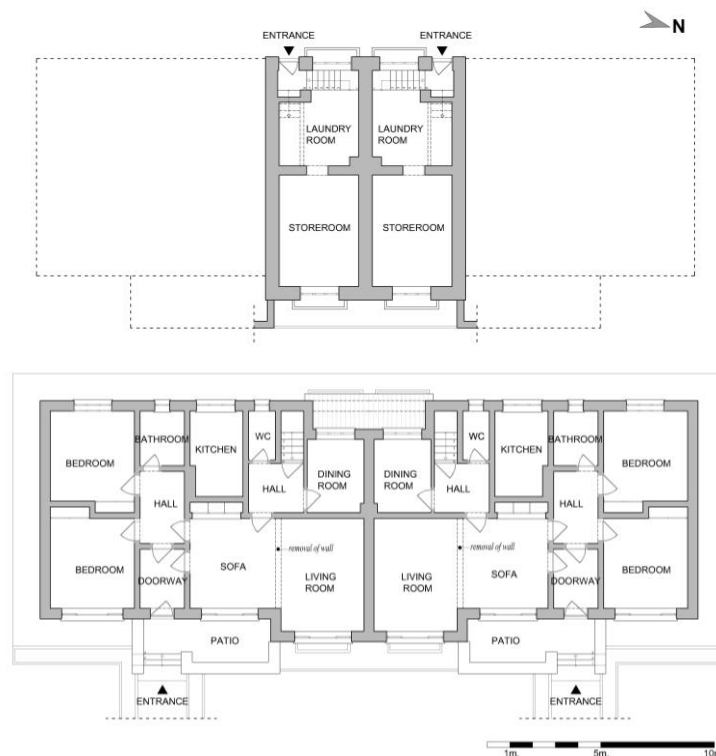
Basement and ground floor plans of Employee Dwelling Type 5
